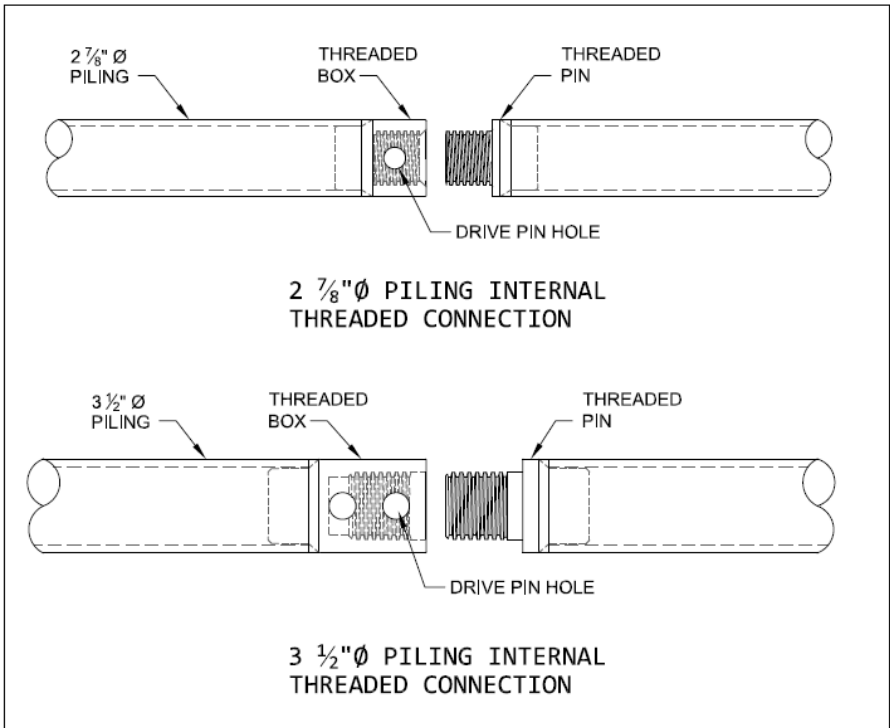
TYPICAL HELICAL PILE SYSTEM INTERNAL THREADED CONNECTION DETAIL
